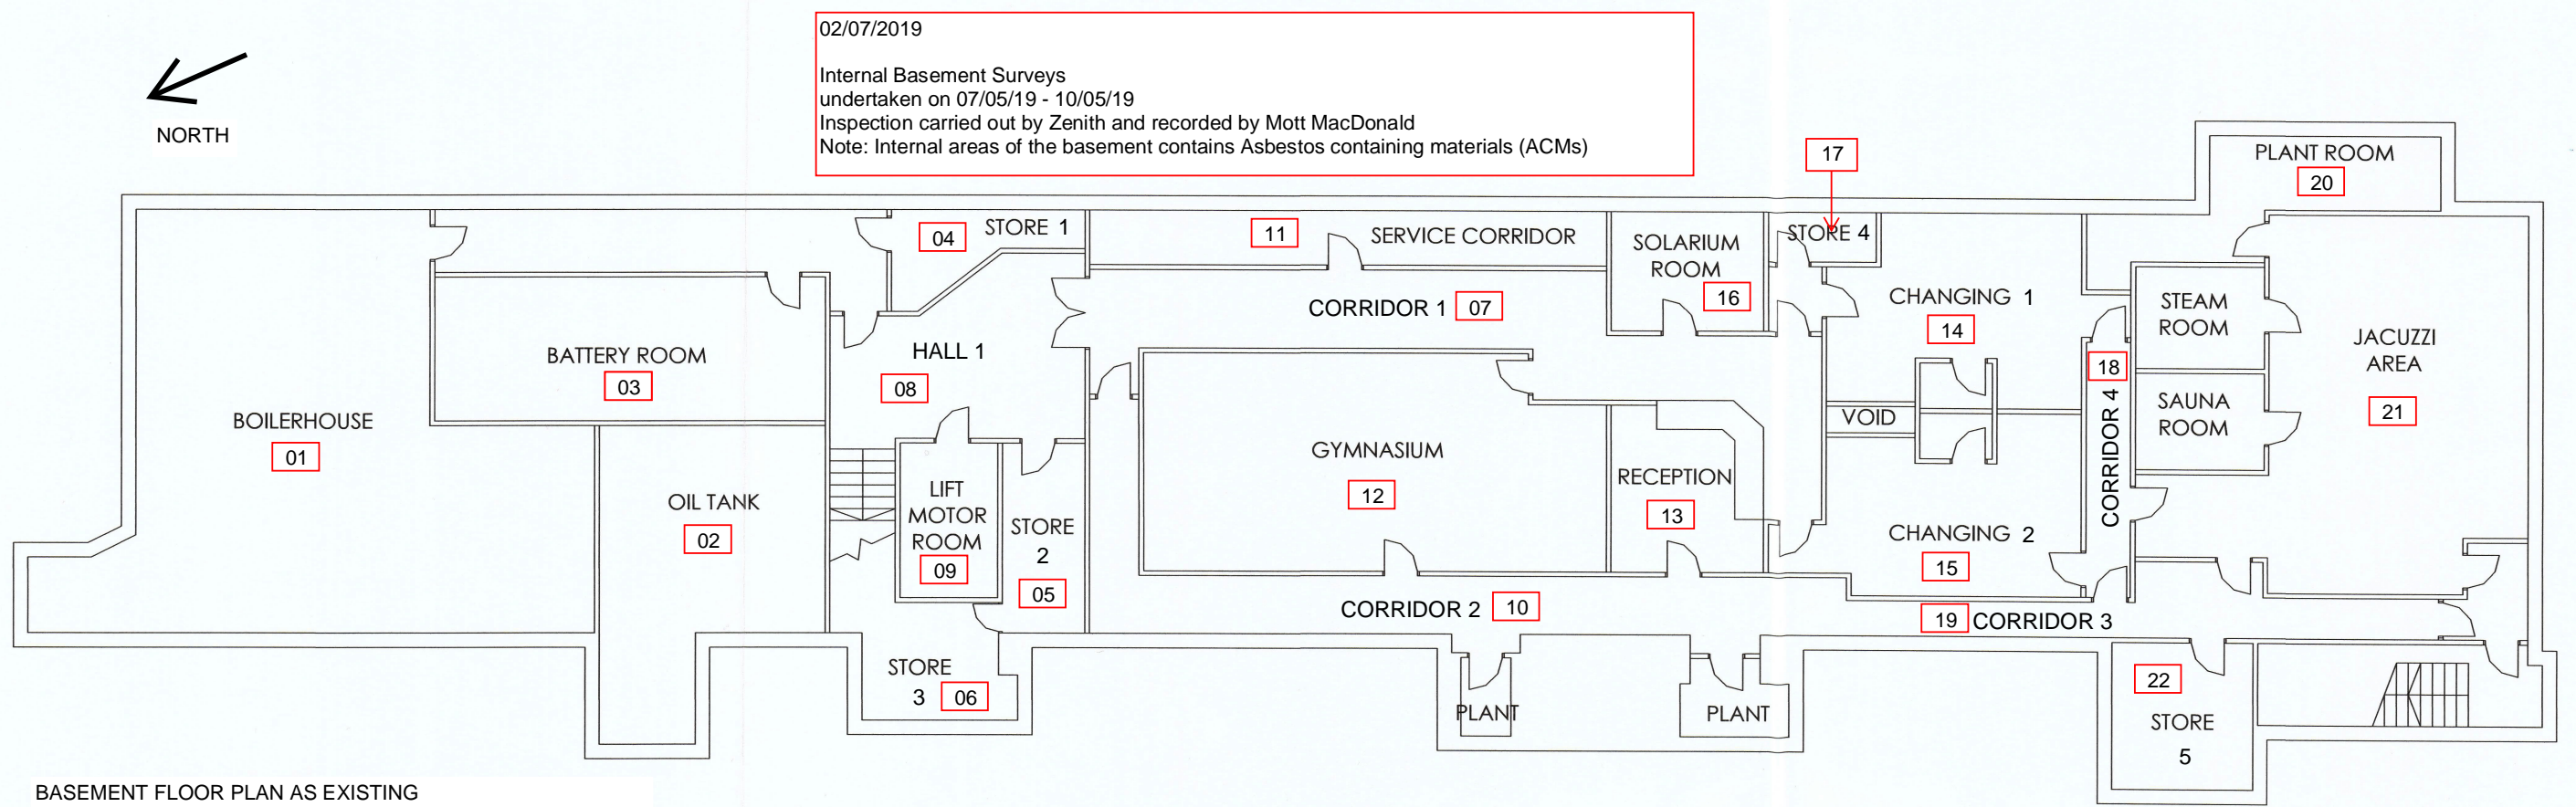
Plan of Station Hotel Building South Block Basement showing Internal Survey Defect/Observation Locations
